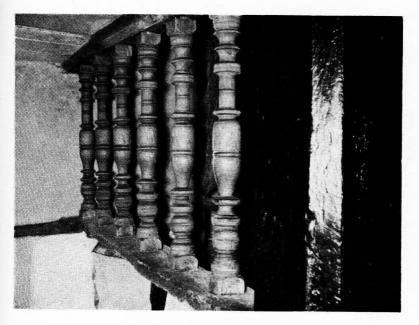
Balustrade to upper landing. STAIR DETAILS, CHORLEY HALL.
